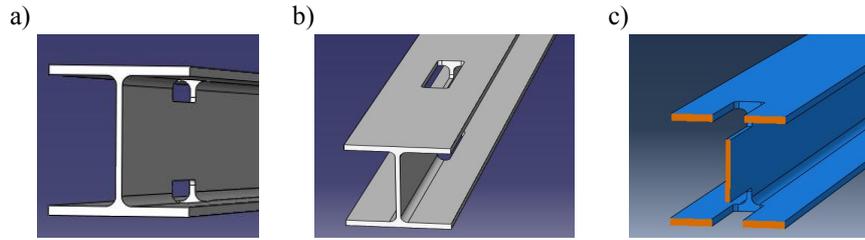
Ductile fuse for W-shape bracing members (Vincent 2008):
